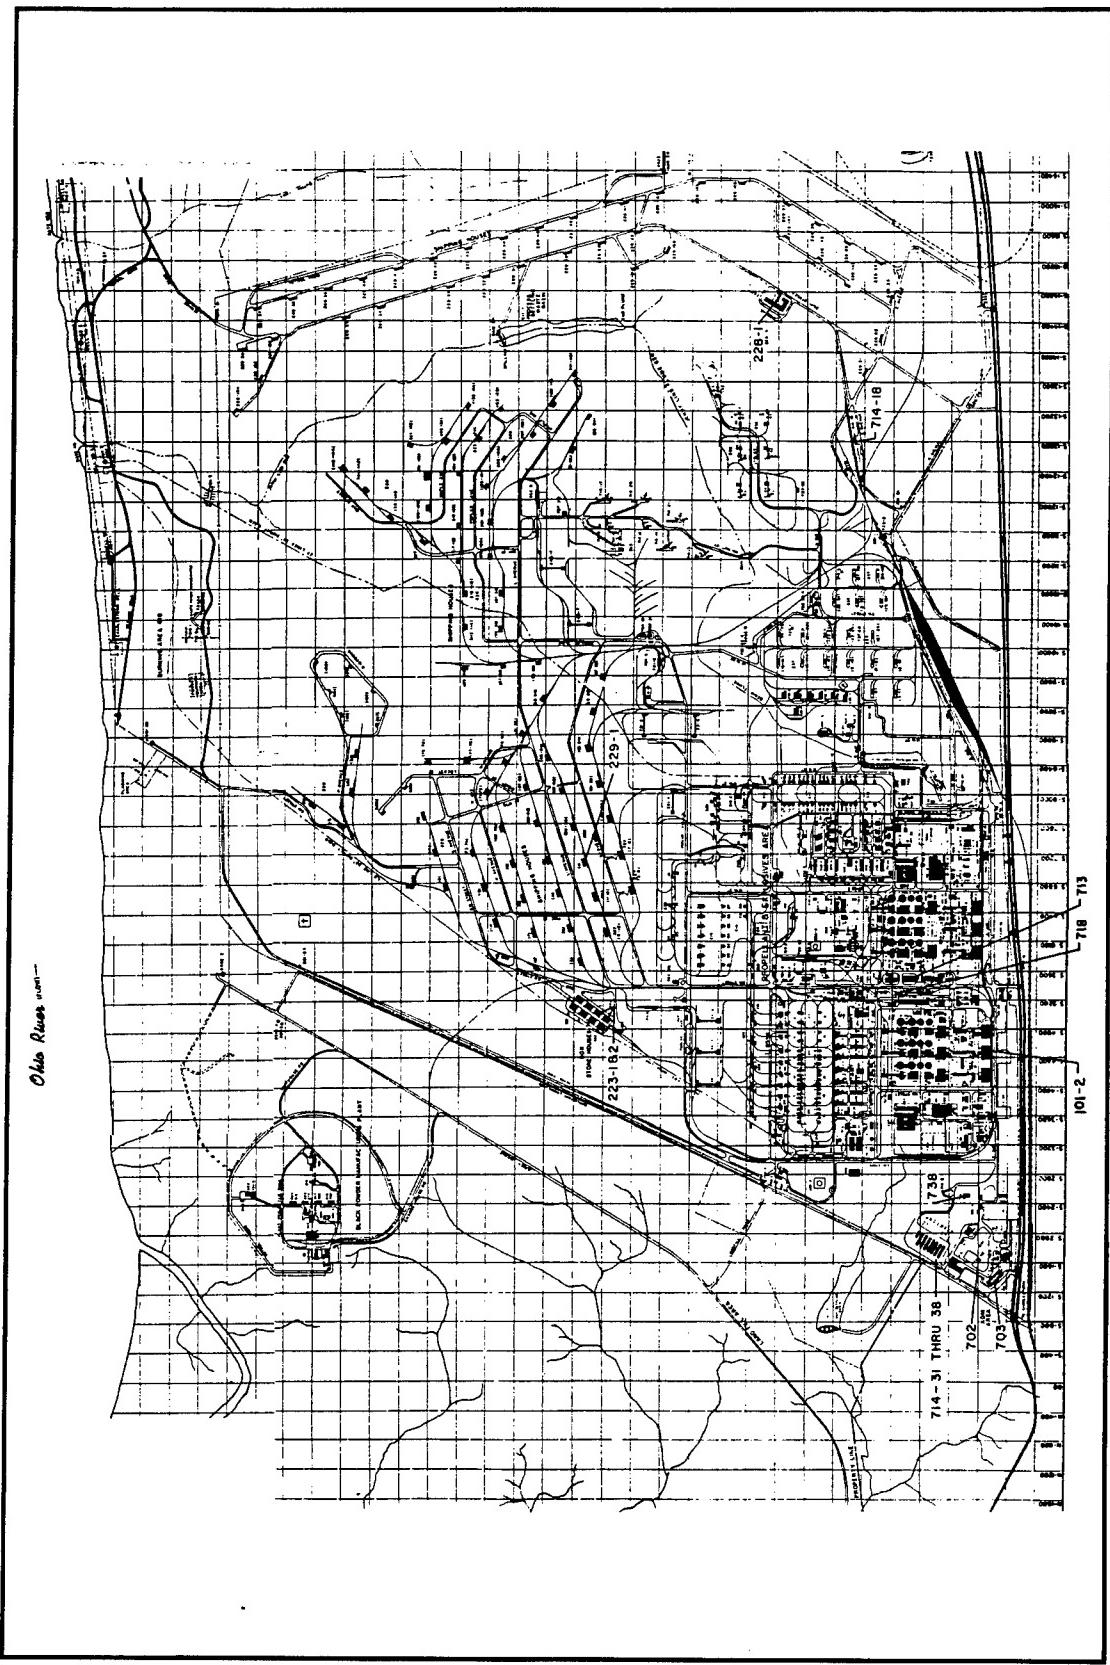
Layout of Indiana Ordnance Works Plant 1 (INAAP Drawing 400-900-100).
